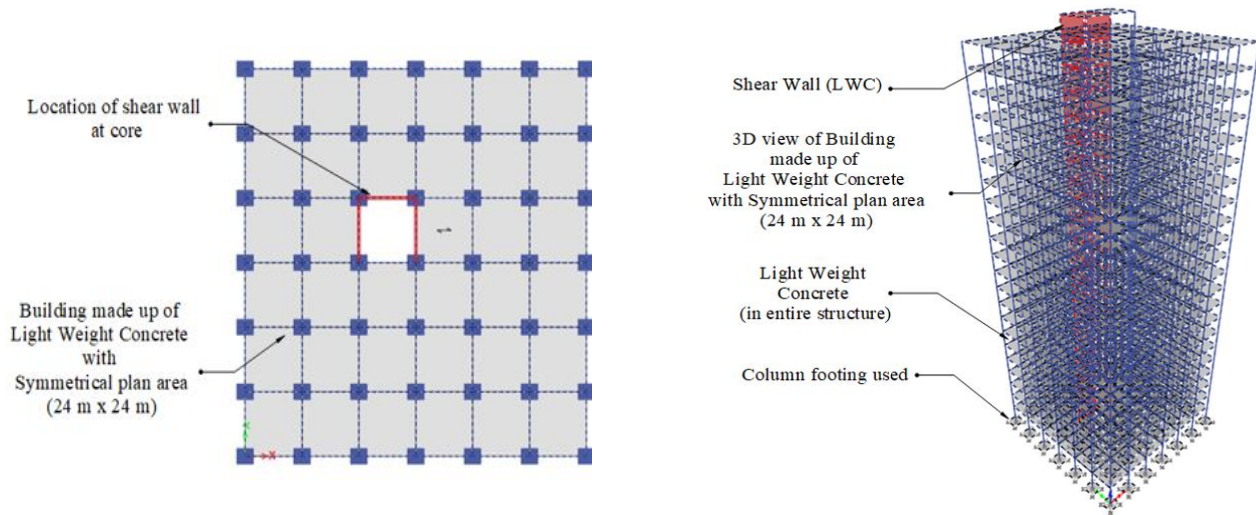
Plan and 3D view of symmetrical plan using Light Weight Concrete (LWC1)
